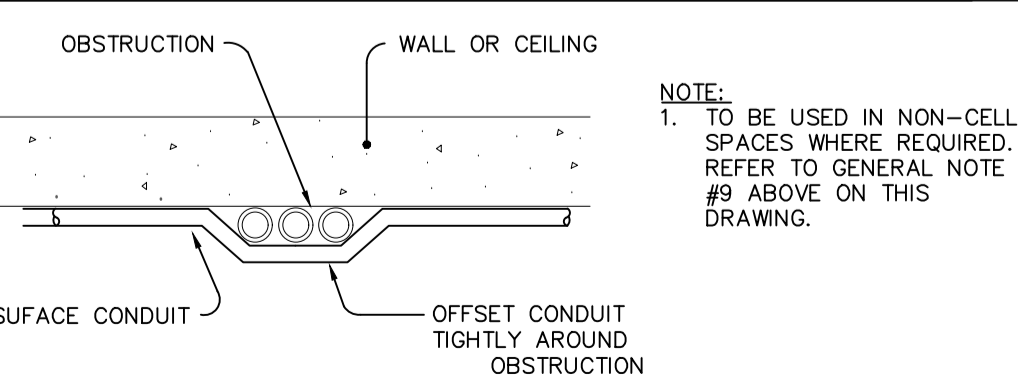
TYPICAL WIRING DETAIL (CONDUIT RUN AROUND COLUMNS.)
